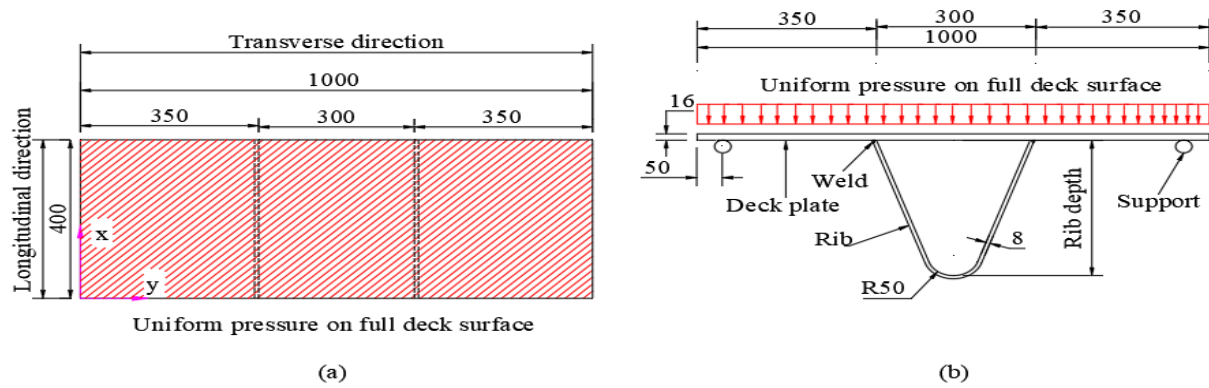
Dimensional details and loading condition of V-shaped rib (a) plan view and (b) cross-sectional view
